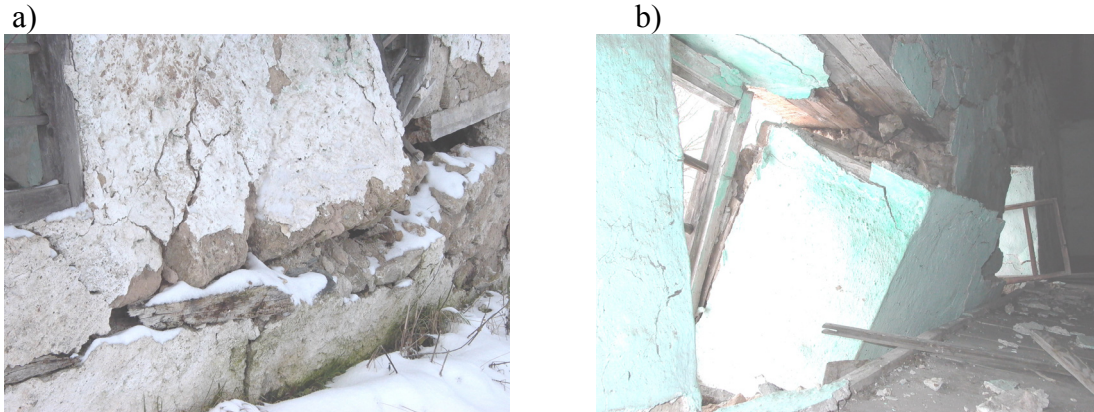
Northeast façade extracts a) total destruction of timber lacing followed by local masonry overturning, b) overturning viewed from inside
